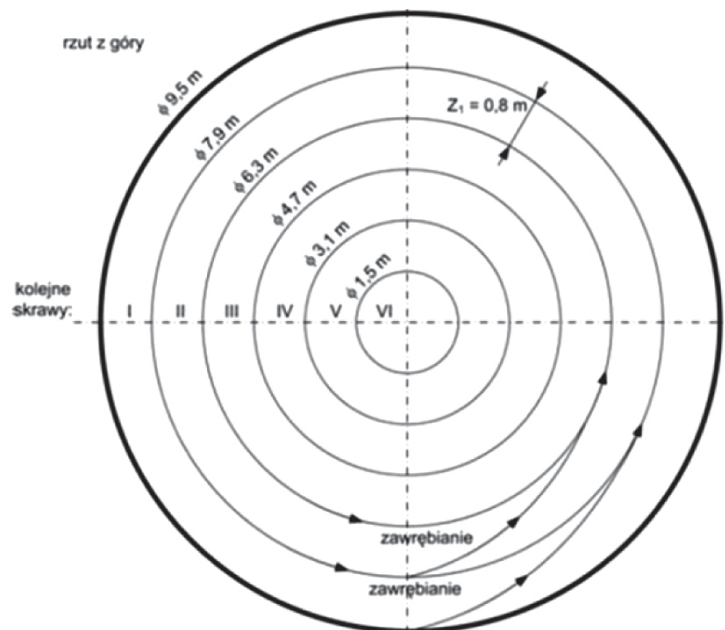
Diagram of technology of making subsequent cuts of bottom of shaft [11]
